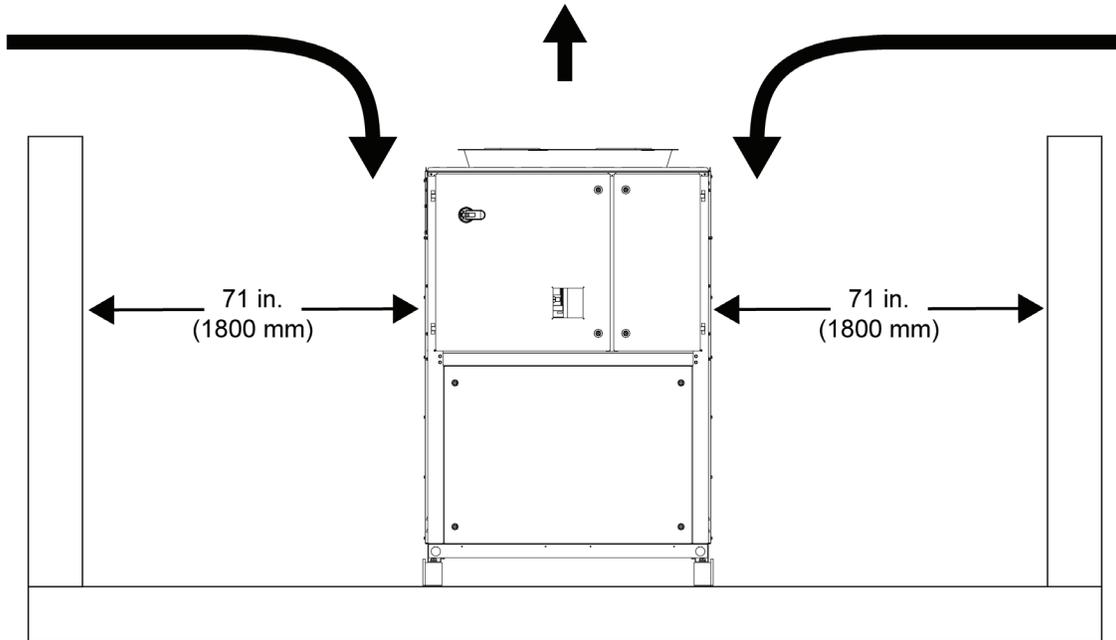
Space Requirements - Installation with Wall Higher than Unit
